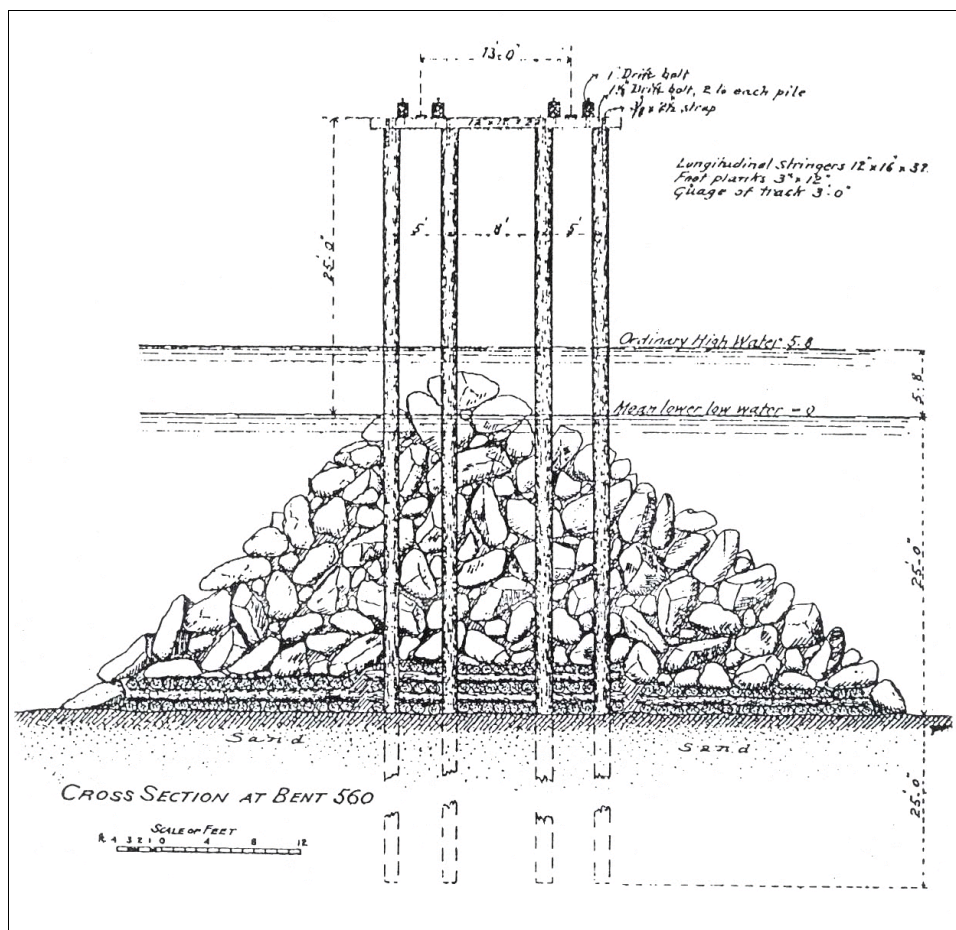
Cross section of North Jetty at Bent 560 showing piling, center mattress, side mattresses (U.S. Army Corps of Engineers 1894[2](4):Section UU3).
